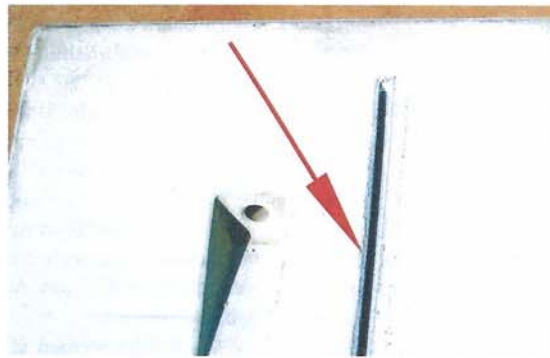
When set in concrete in tubbing segments Jordahl®-anchor channels ensure cost-saving and reliable fastening of installations and loads.
